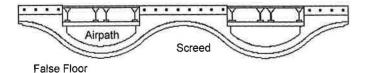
Sinusoidal advanced FES ceiling planned for the BRE's 'office of the future'
